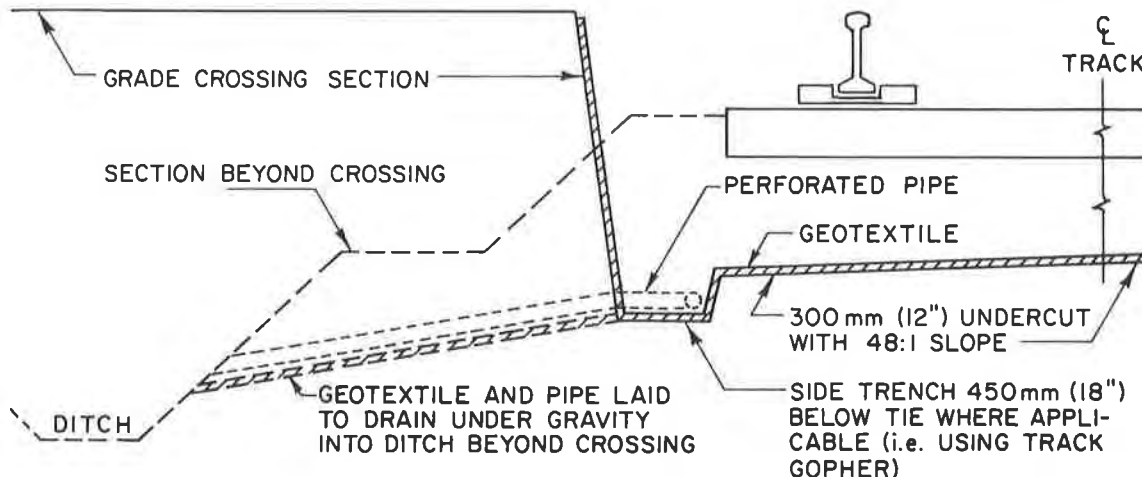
GRADE CROSSING GEOTEXTILE INSTALLATION
